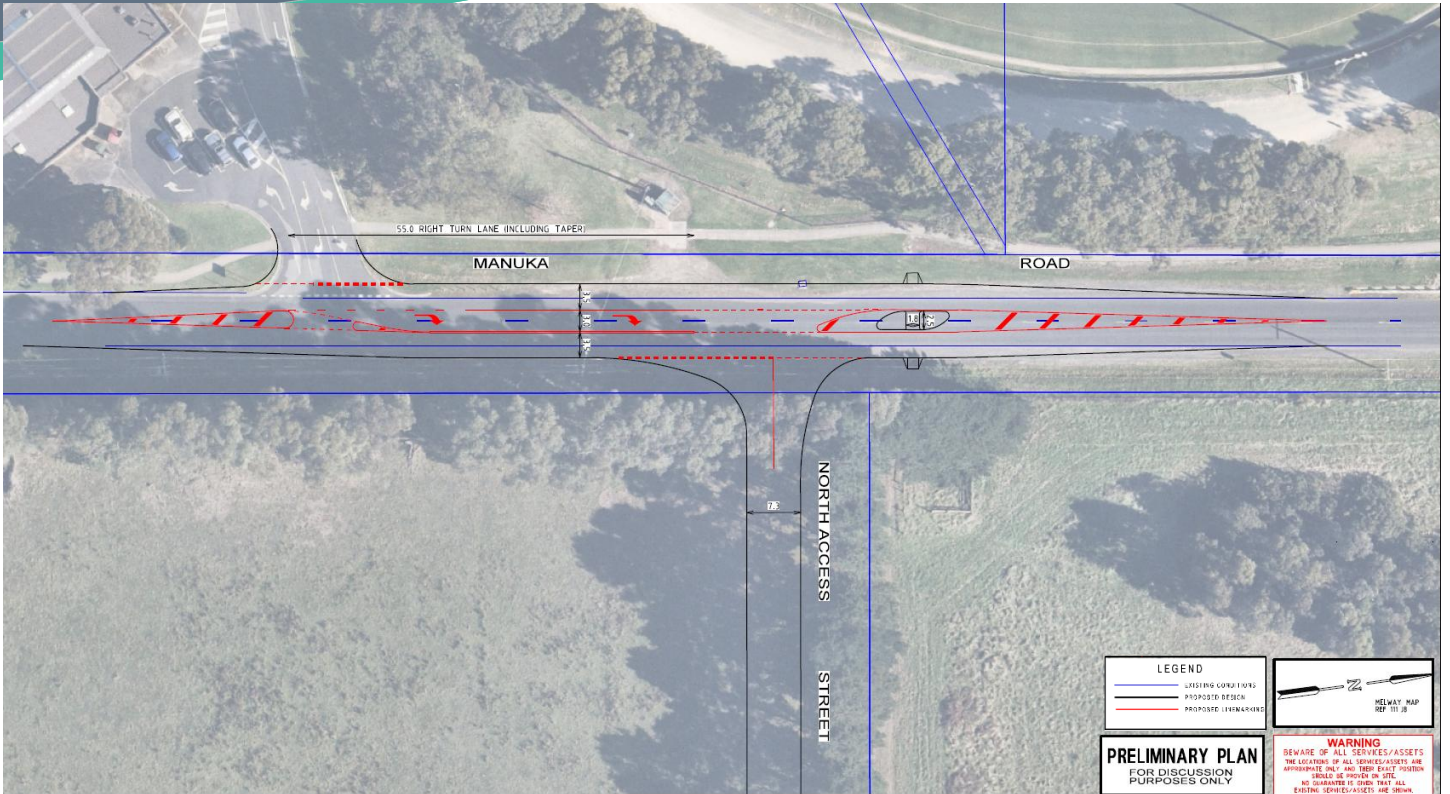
A - Manuka Road / Northern Access Street Right Turn Lane Treatment
